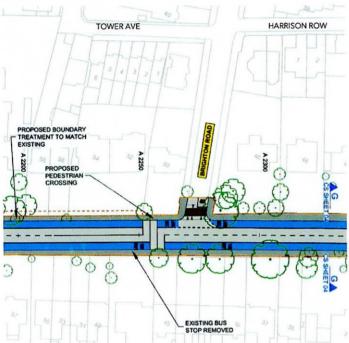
Extract of the Templeogue / Rathfarnham to city centre core bus corridor scheme General Arrangement Drawings, Sheet 07 of 42, April 2023
